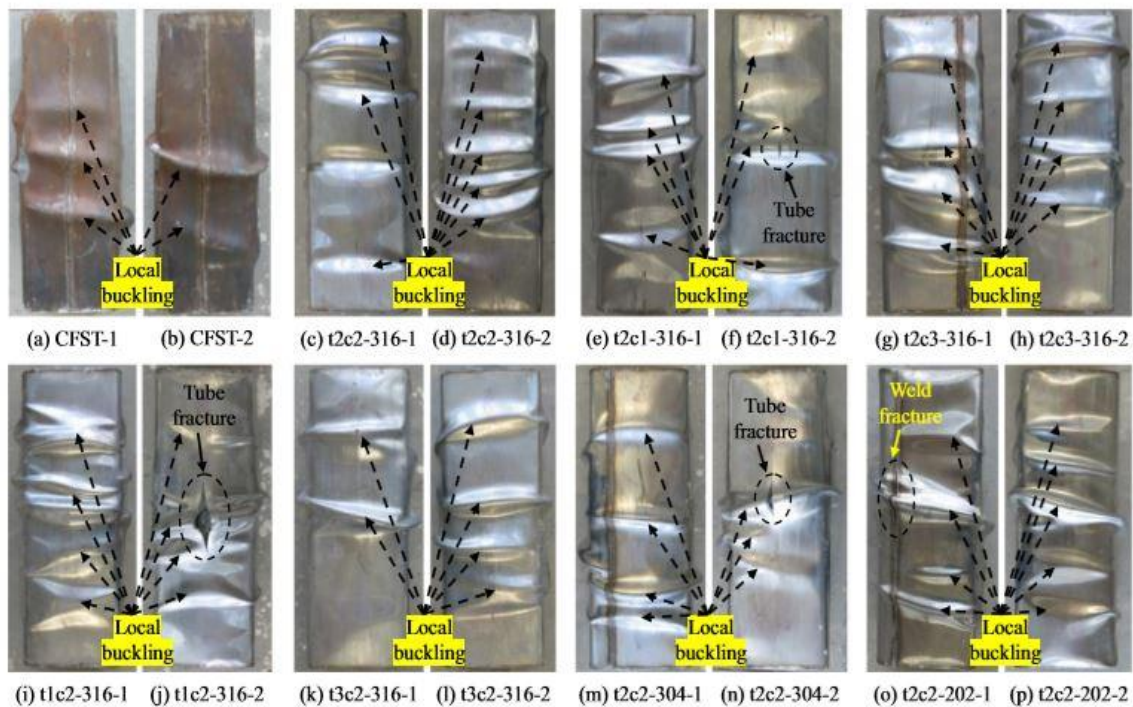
Overall Failure modes of the CFST and CFBT Specimens [1]
